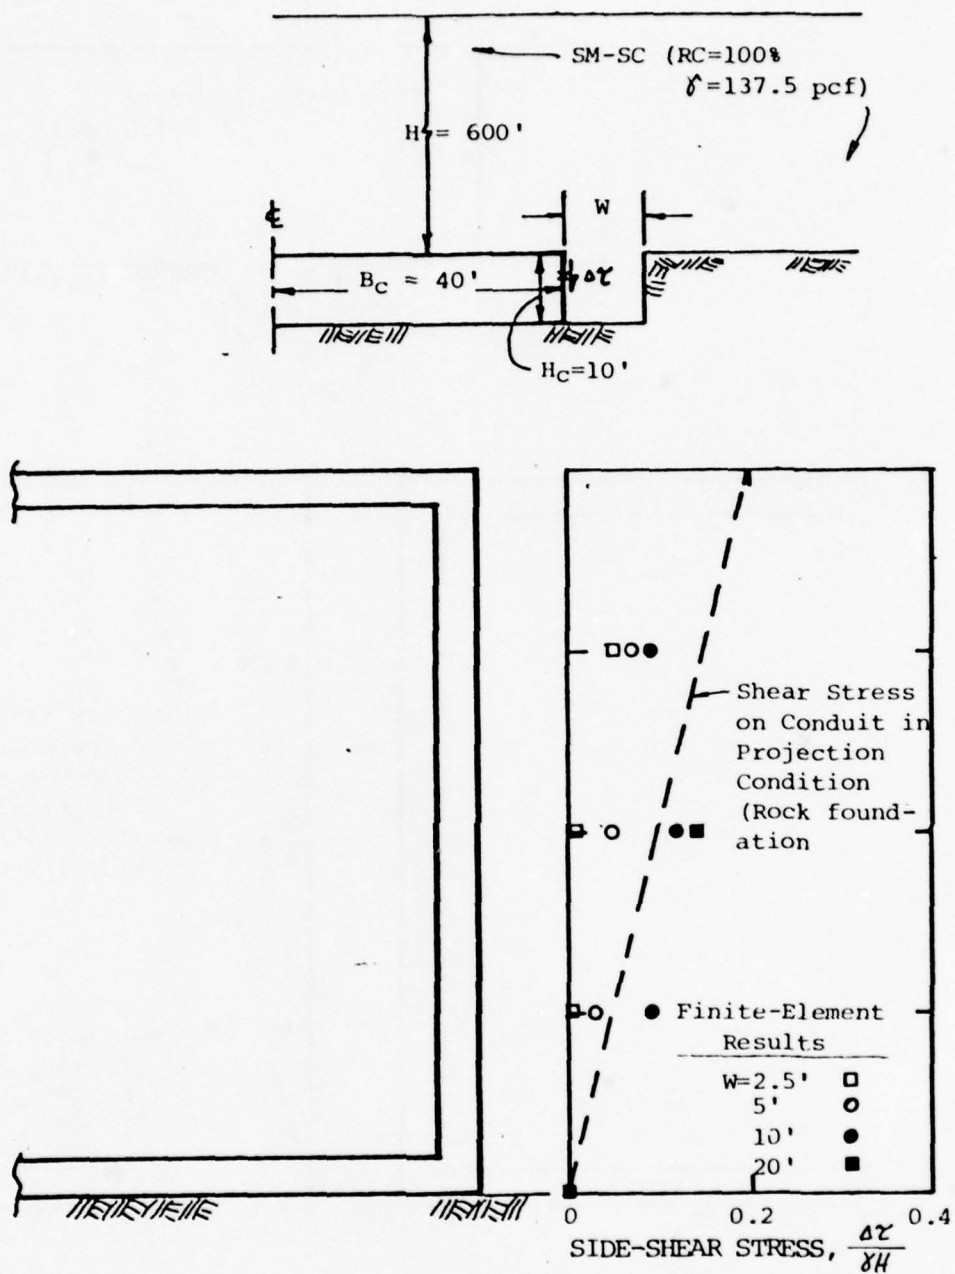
SIDE-SHEAR STRESS ON RECTANGULAR CONDUIT IN SHALLOW TRENCH WITH VERTICAL WALLS
